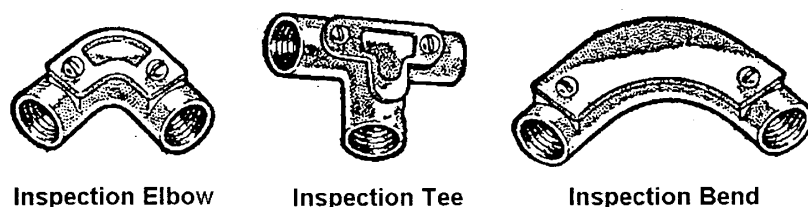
Types of Inspection Conduit Fitting
